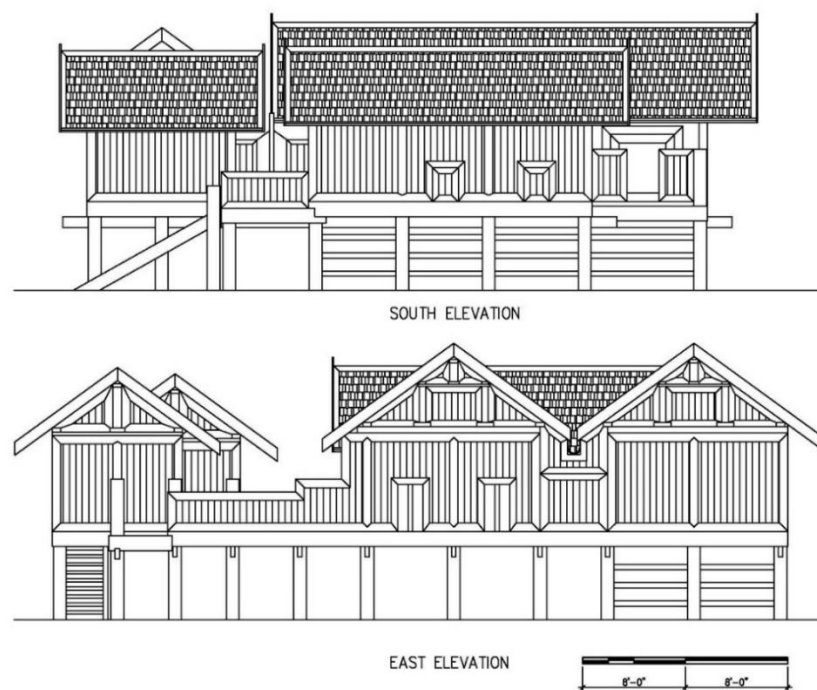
Elevation drawings of U Kyin Oo House, drawings from U Myo Myint Sein and Team (Team, 1970)
